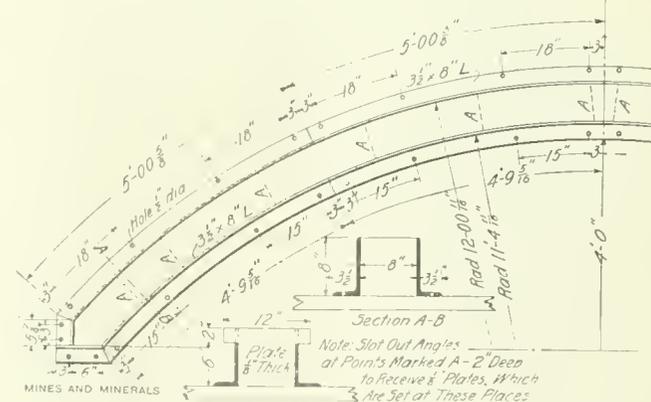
STEEL FORM FOR MAKING CONCRETE BLOCK ARCH
